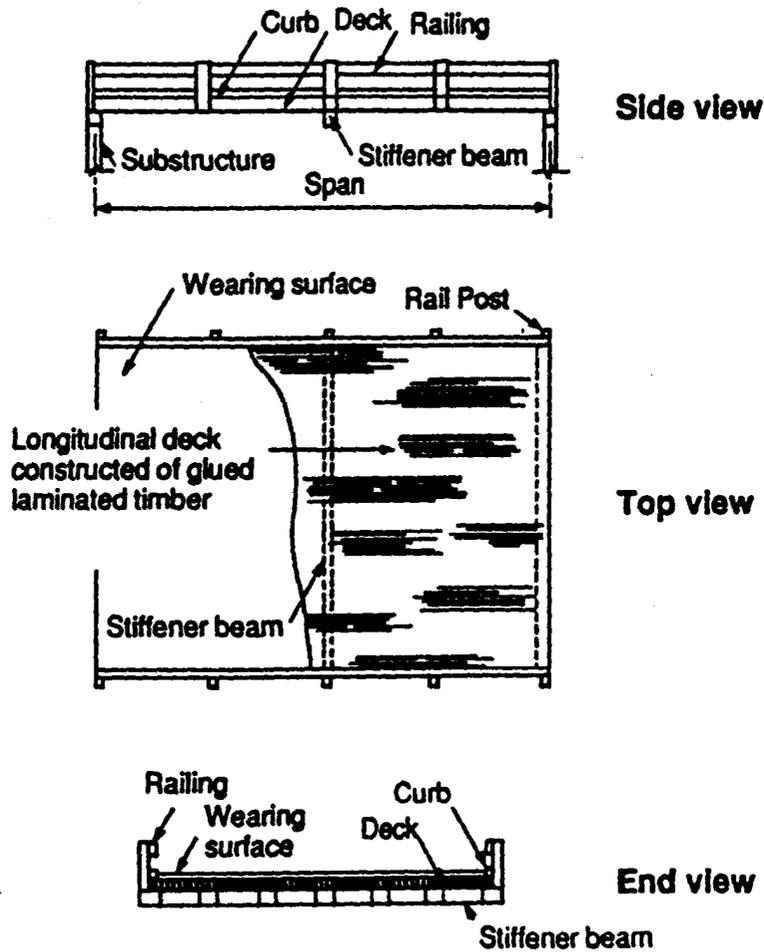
Typical configuration for a single-lane longitudinal deck bridge.
